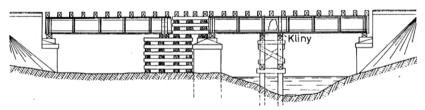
Provisional reconstruction of a two-span bridge using damaged plate girders (right span) (Cholewo & Sznurowski, 1970; Miklin & Sawicki, 1993)
